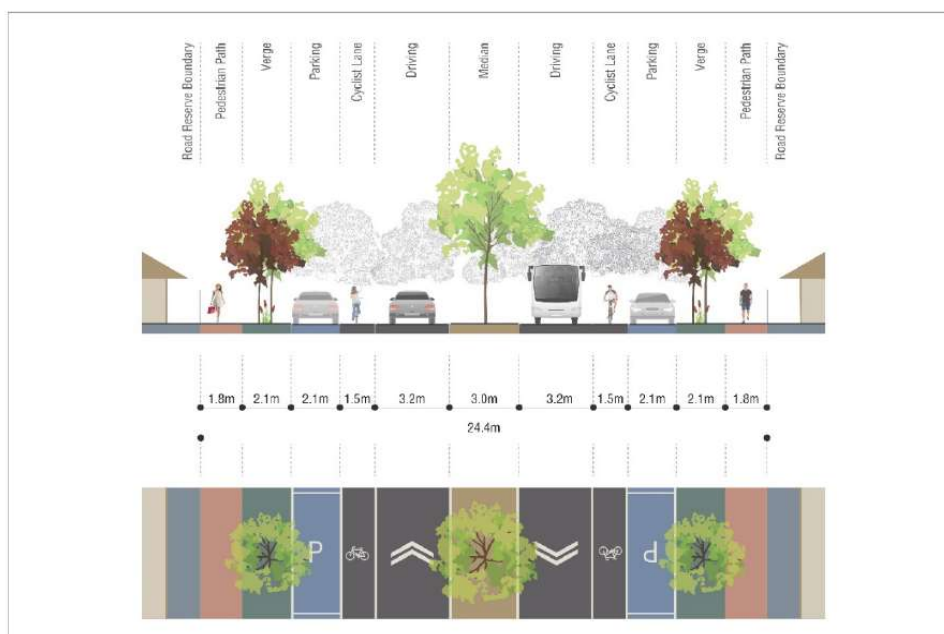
RD14 TOD Connector Boulevard (Milner Road to Enterprise / Ibis), RD15 TOD Connector Boulevard (Milner Road to Brae Road) and RD16 TOD Connector Boulevard (East of Brae Road) Cross Section
